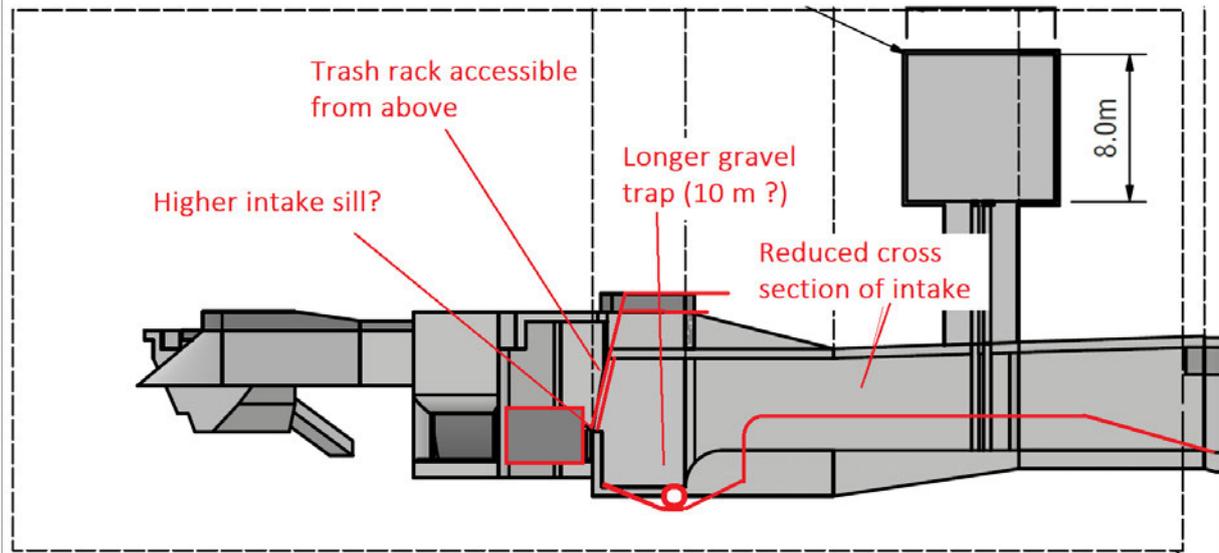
showing possible improvements of the desander. Inlet zone is of special importance as gravel is likely build up quickly here. (Tranquilizer which is good for improving trap efficiency will actually add to this.) This issue can be solved proper design of the sluicer.
